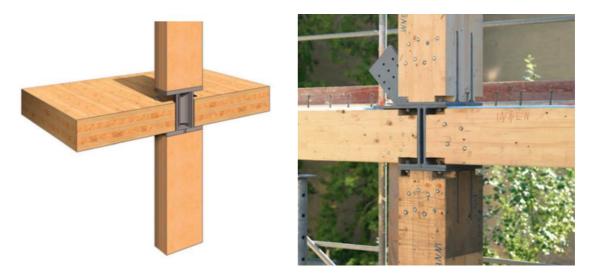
a, b. The floor-wall joints in the platform structure (Kaufmann et al. 2018).
